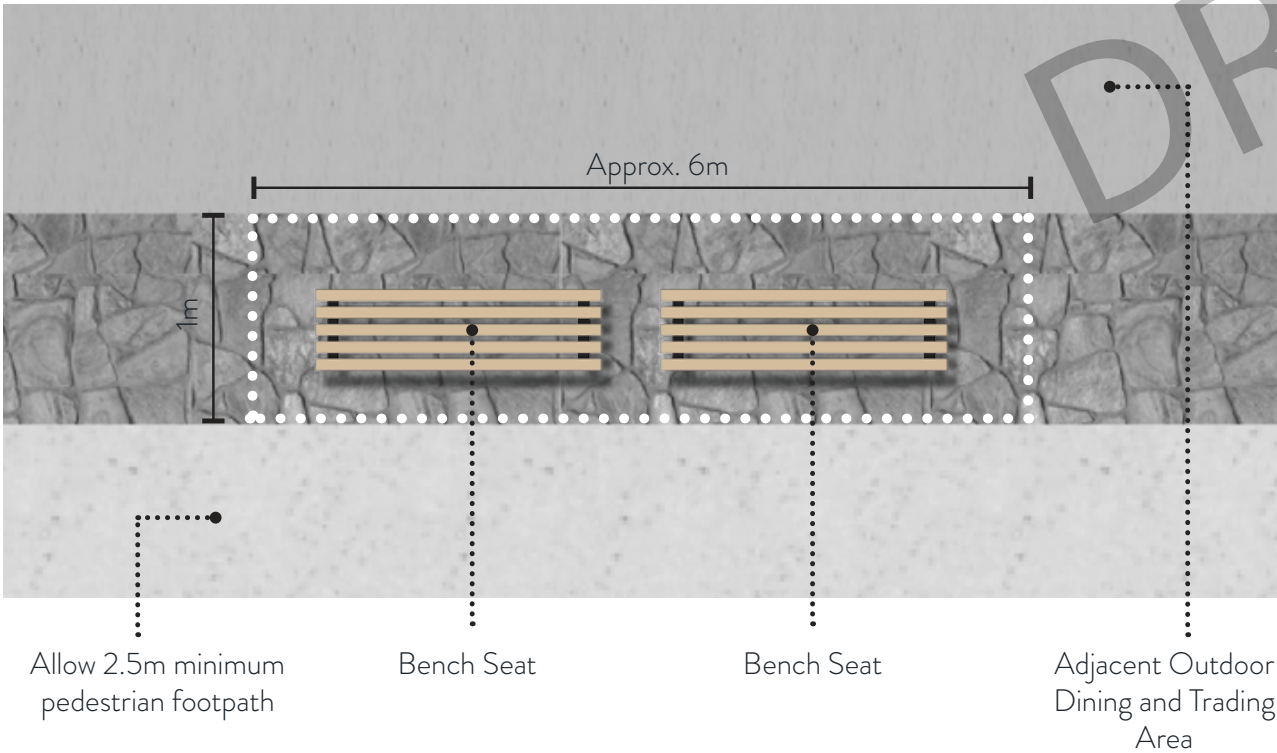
Furniture Arrangement Type 1 - Bench Seats within the service area of the road cross section.
